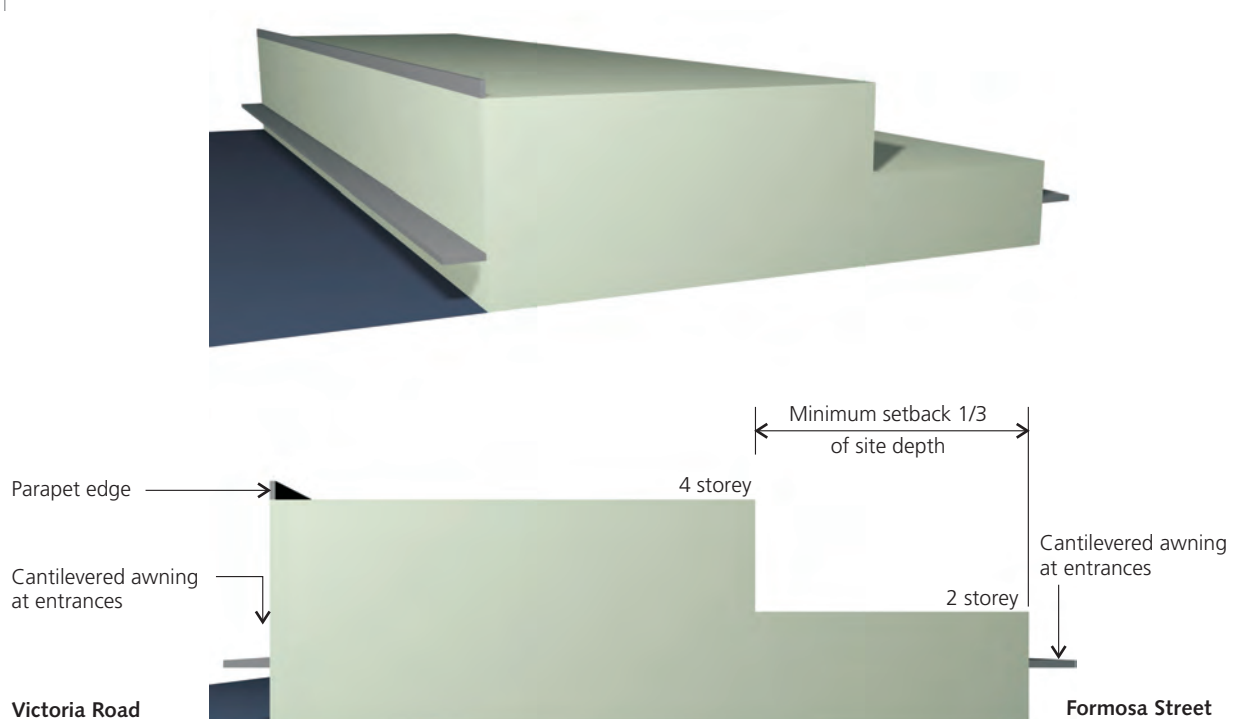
3D envelope for Victoria Road / Formosa Street - 4 storey building
